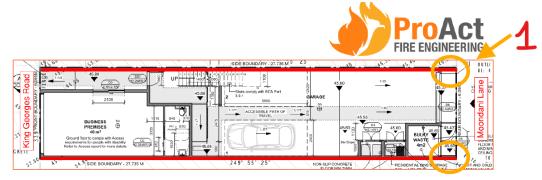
Indicative fire wall markup – Ground floor. Note: fire wall and fire rating markup may be indicative, and the building shall meet NCC DtS and certifier's requirements for fire rating in the DtS areas
